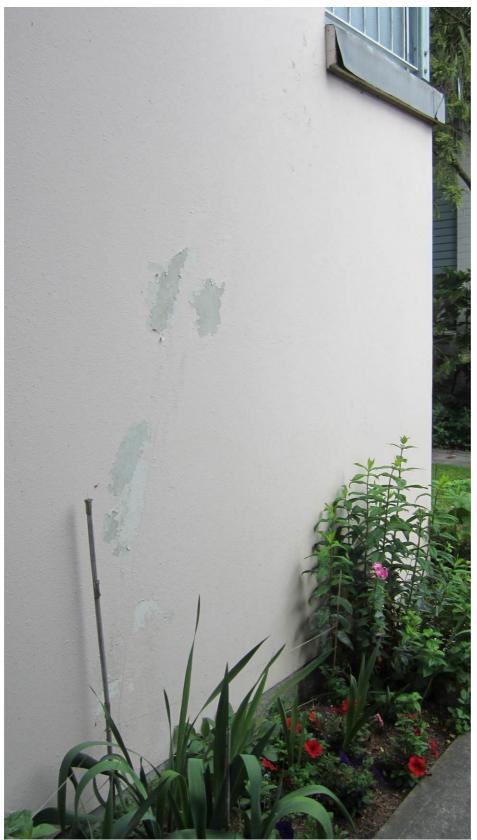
Precast concrete wall panel at end of Block B.Damage Description: Cracking of precast reinforced concrete panel (diagonal from balcony - 0.1mm crack width)
